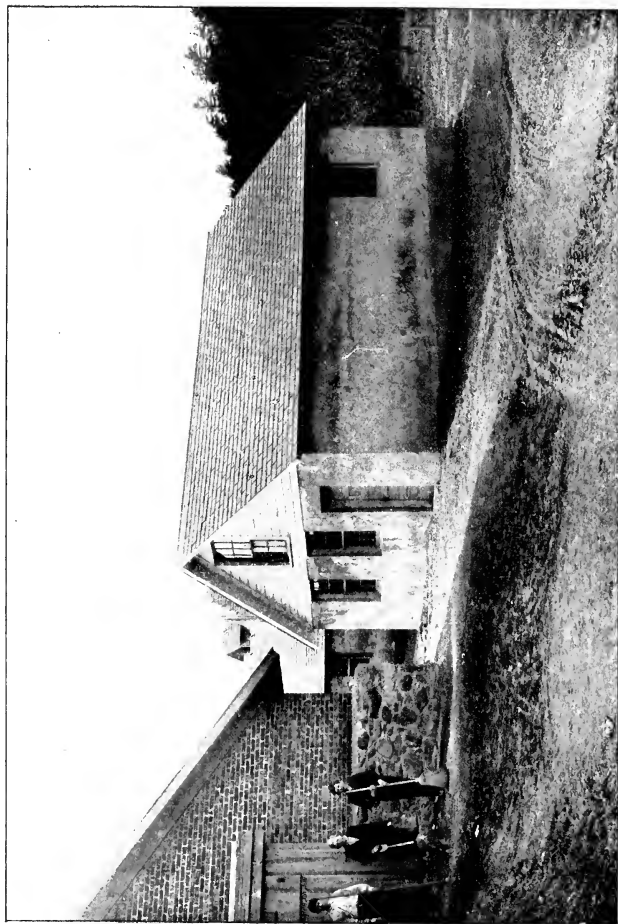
CONCRETE MILK HOUSE AT BERKSHIRE INDUSTRIAL FARM, CANAAN, N. Y.
